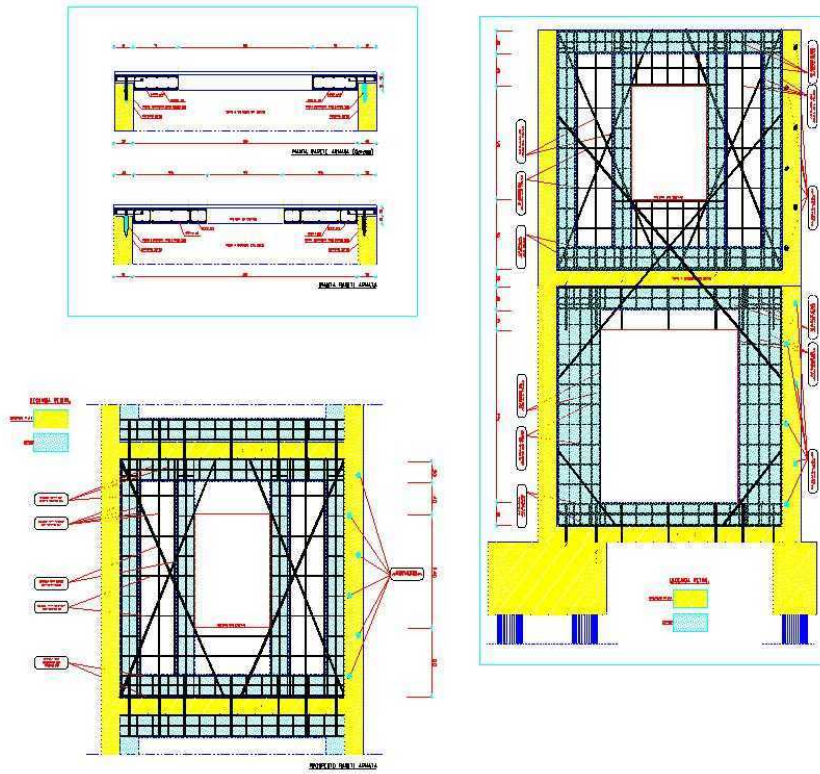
F: Seismic Strengthening- Details of New RC Shear Wall
